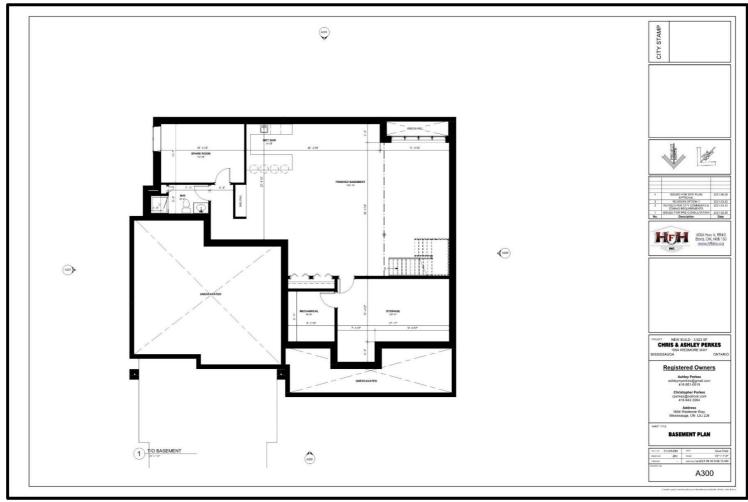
Proposed Development – Basement Plan (H4H Inc. 2021)
